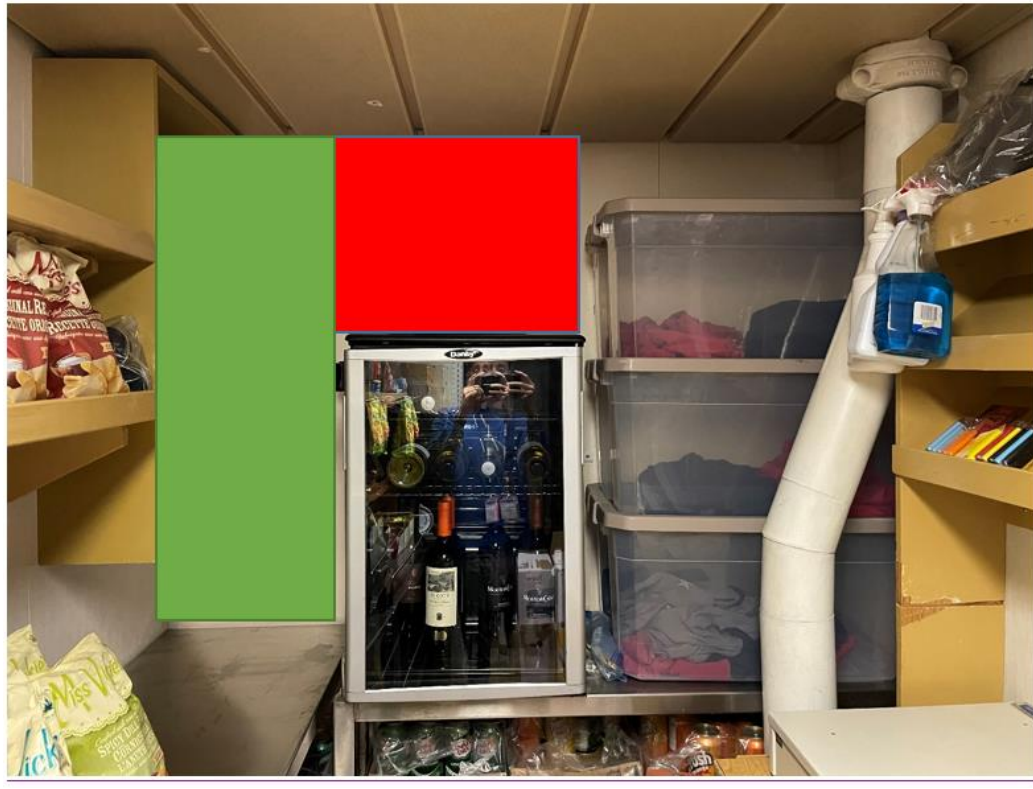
Location for new cabinet in red and new shelves in Green.
